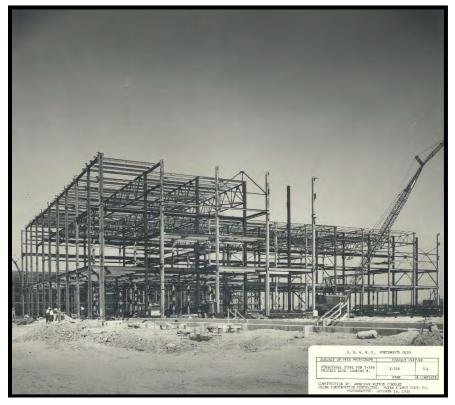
Structural Steel Work for the X-326 Process Building, Looking North, October 1953
